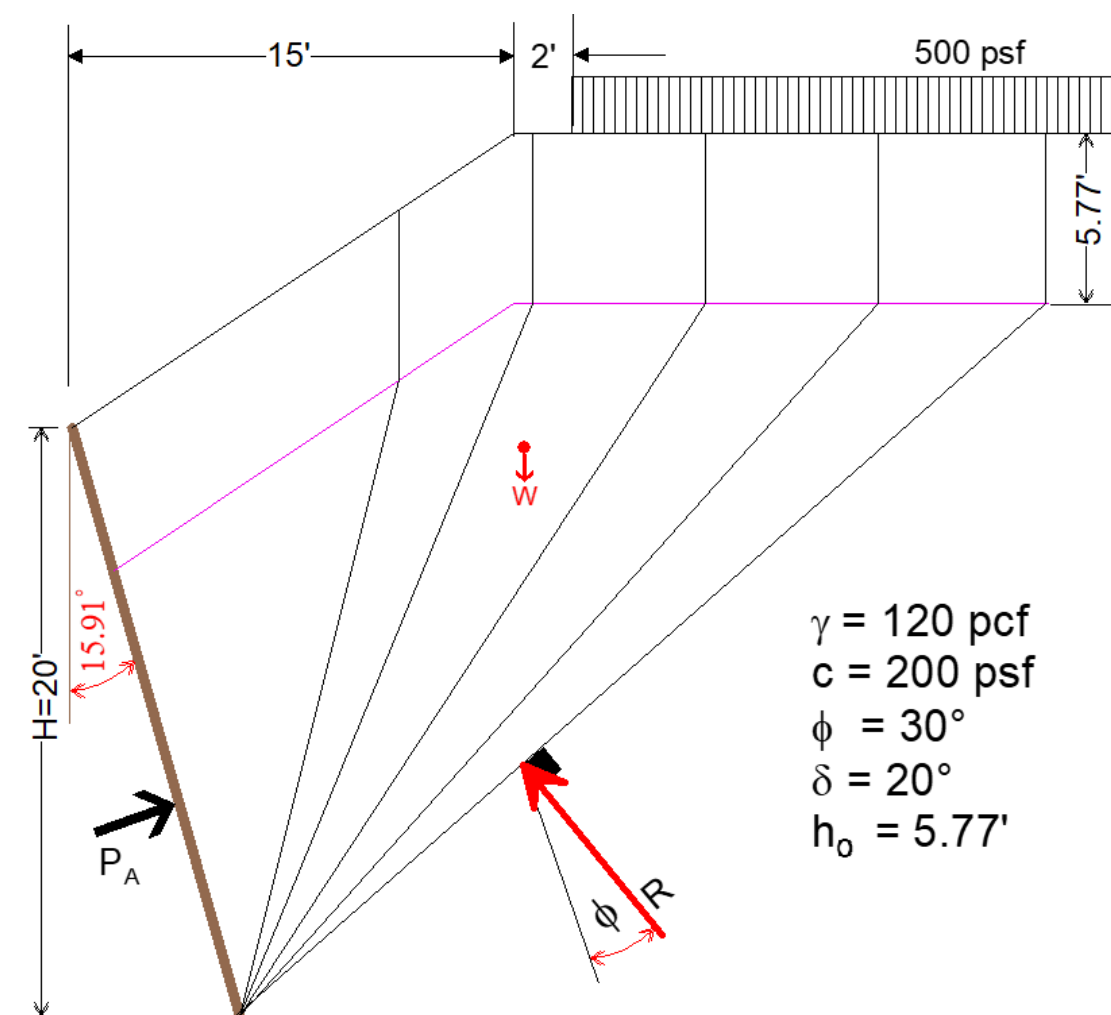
Gravity Retaining Wall with Irregular Backfill by Culmann Method
